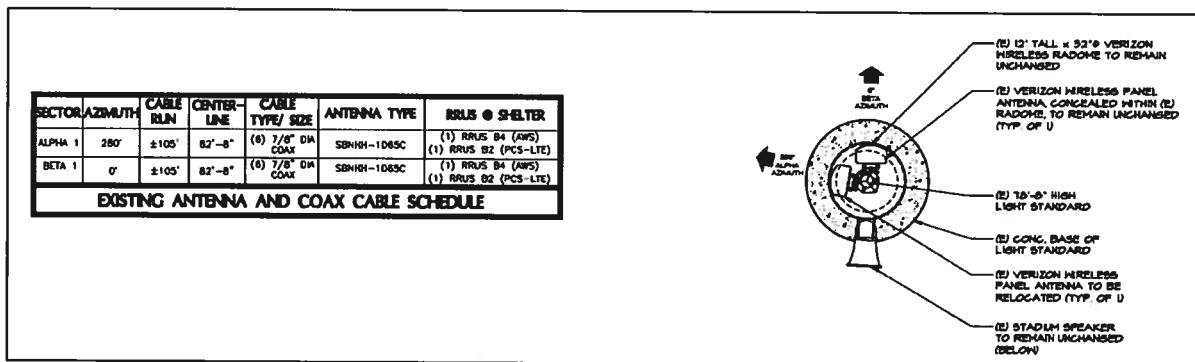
Existing Antenna Plan View (Source: Plans dated 01/23/19).
